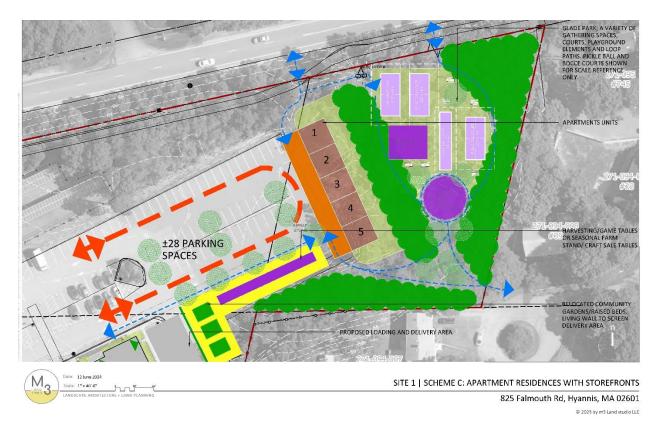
Site 1 | Scheme C. See Appendix for 11x17 scaled plan drawing.
